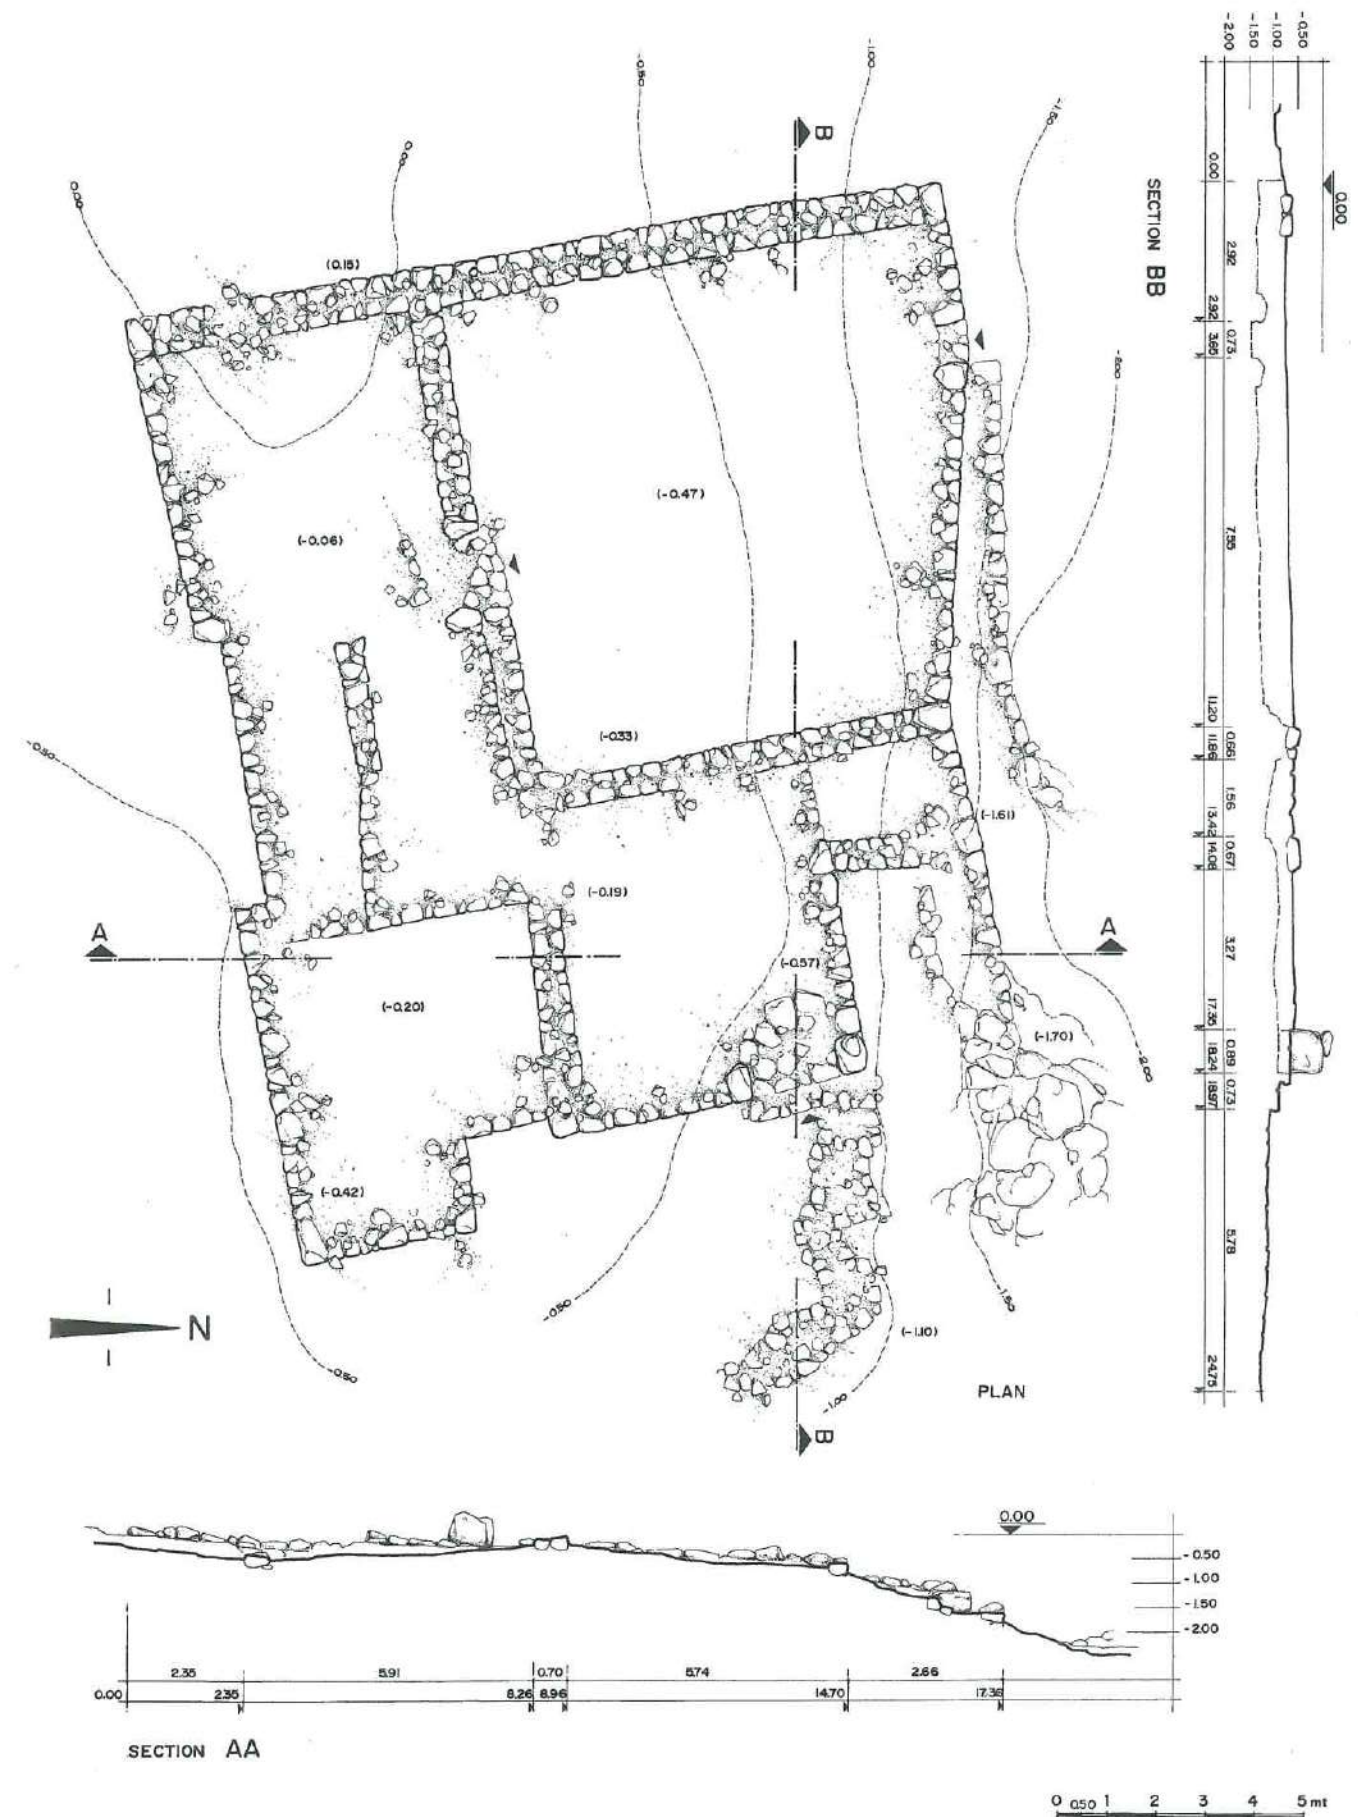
Al-Ḥajfah (Dhamār). Plan and sections of building HG*i*.
